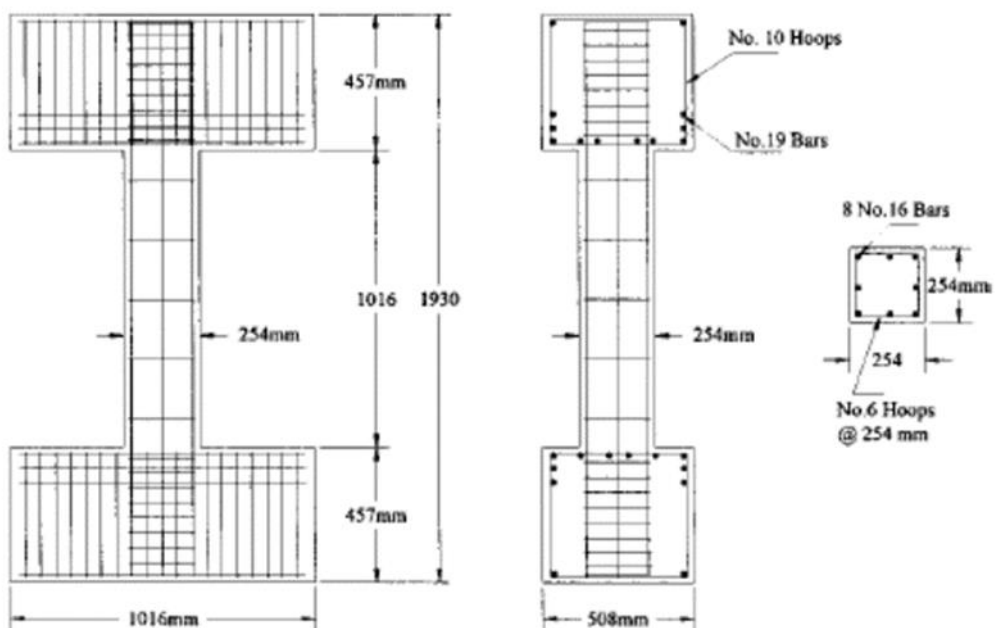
Detail of the column specimens (Xiao and Wu, 2003)
